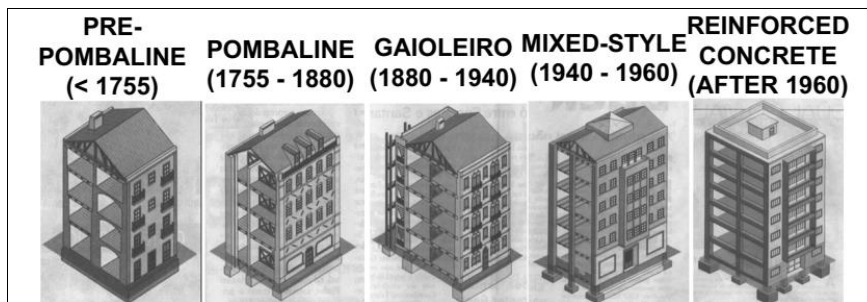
Types of Portuguese old masonry buildings (Meireles & Bento, 2013).
